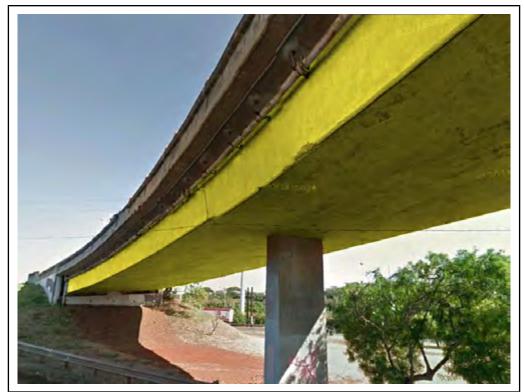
Reinforced Concrete Closed Web / Box Girder (Highlighted)
